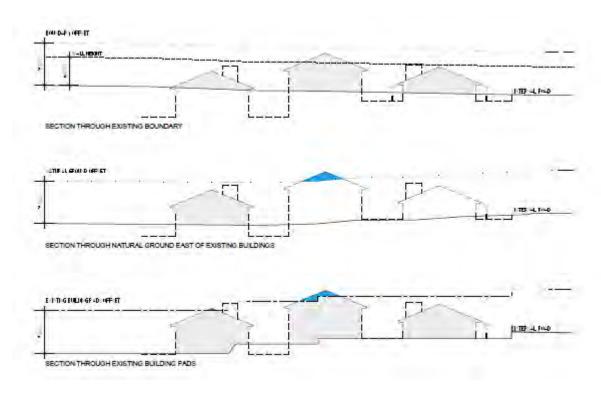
Building height above 9 metre using existing (excavated) levels as a base
